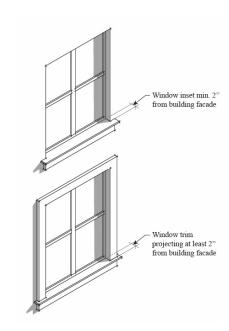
Windows inset from the building facade add to the richness of the building facade.
